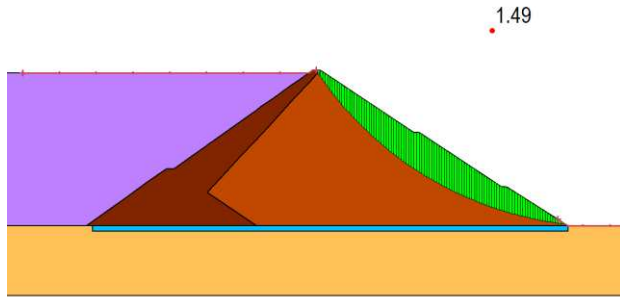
Potential Critical Failure Surface, Case Study 1 Mine Tailings Storage Facility with Rockfill Dam.
